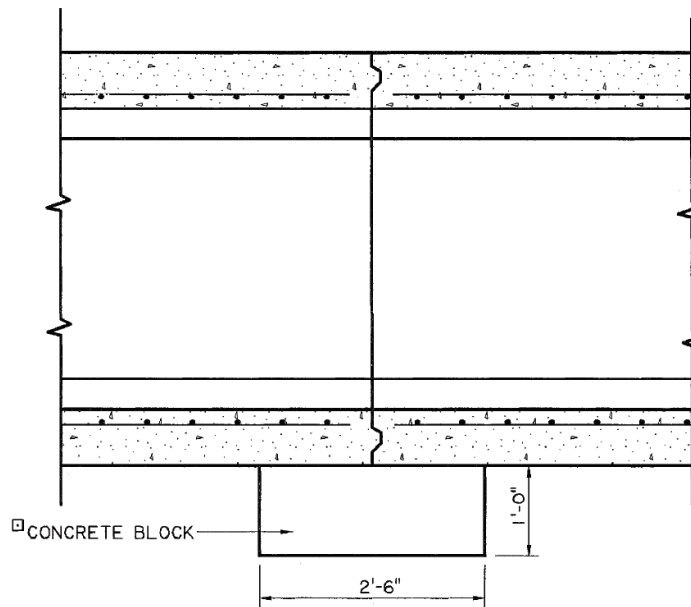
La DOTD Culvert Barrel Elevation View and Transverse Expansion Joint Location
